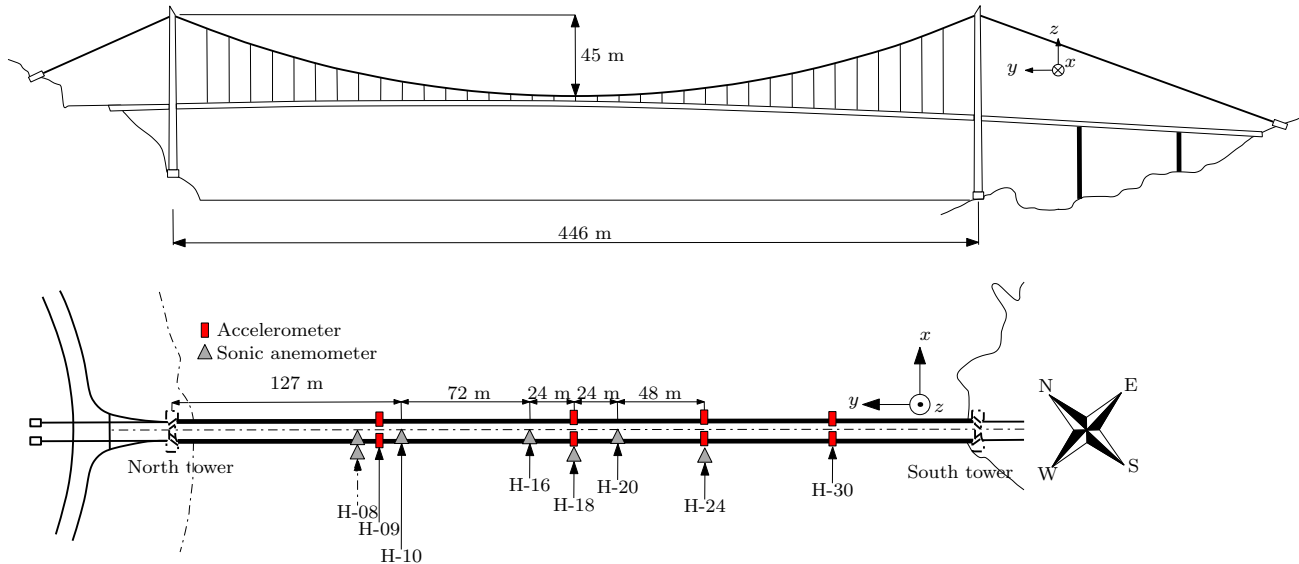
Elevation and plane-view of the Lysefjord Bridge.
